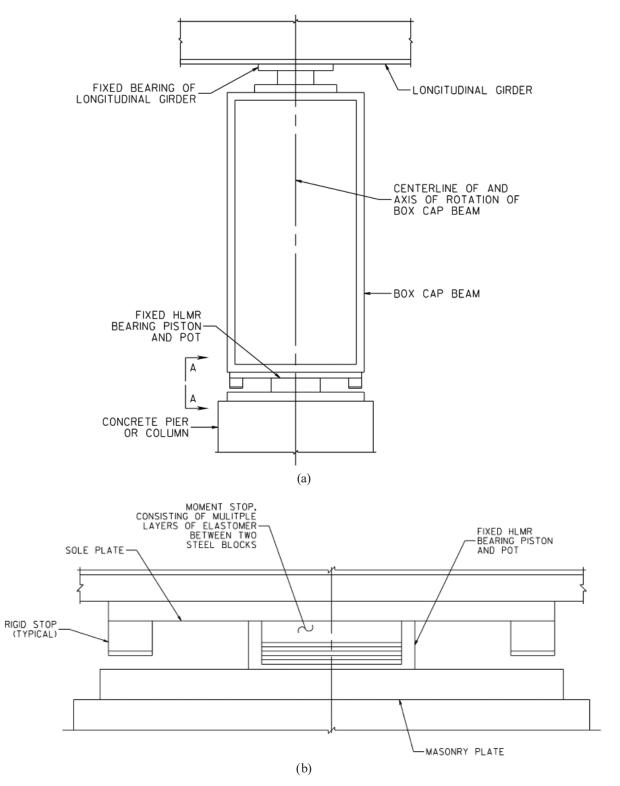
Rigid moment stop section view (a) and elevation view (b)
